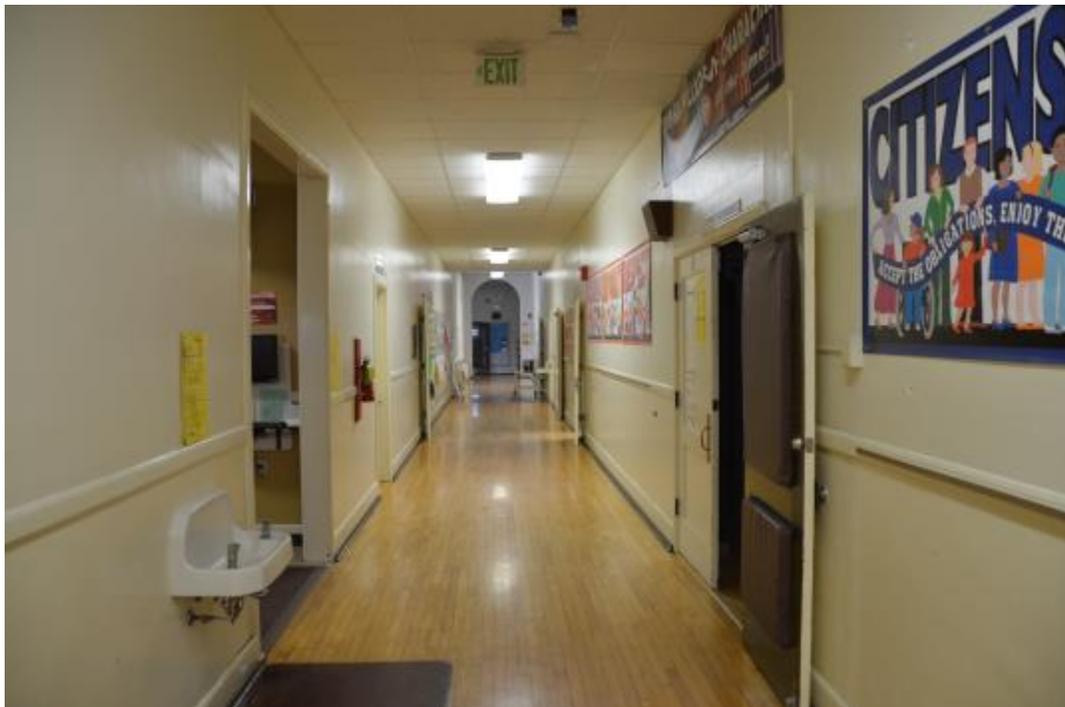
Looking North Along Main Hallway, From Near Front Entry
